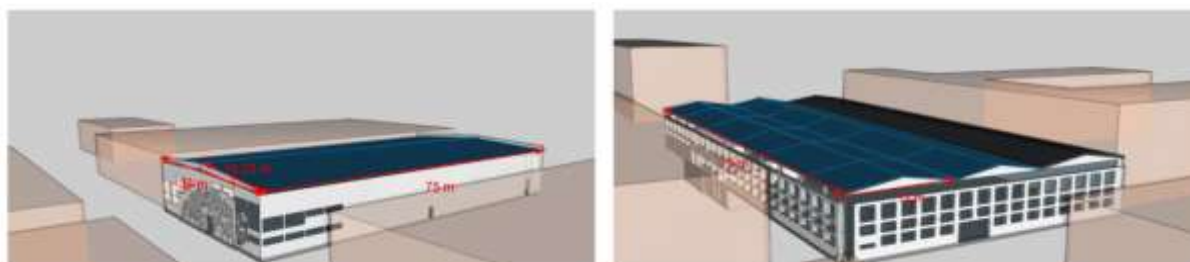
Possible PV installation in Krakow (building 2 on the left and building 1 on the right)
